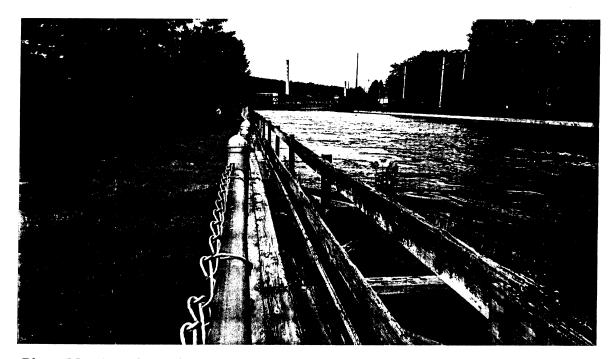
View of the Power Canal right-of-way looking from the No. 1 Powerhouse intake structure towards the 11- 15 Power Street property
